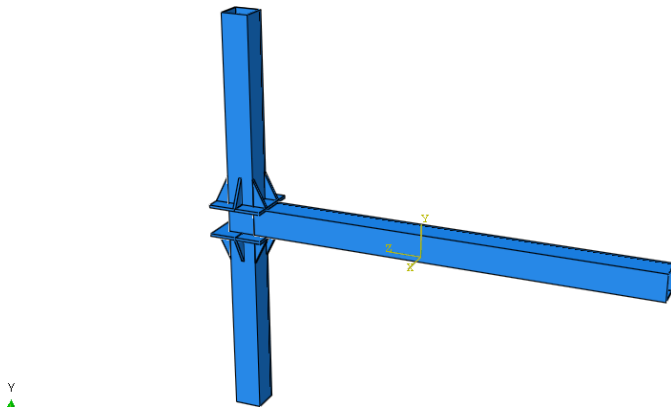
CONNECTION DETAIL USING CHANNEL SECTIONS
